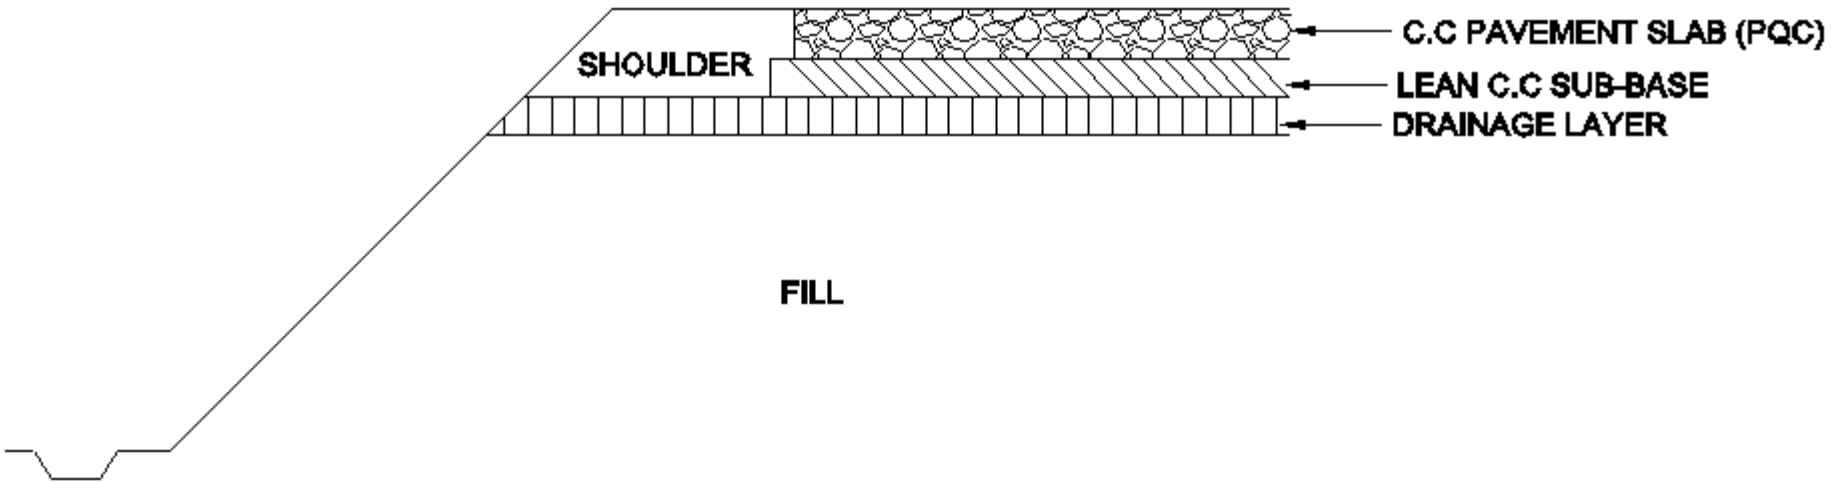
TYPICAL CROSSECTION OF CEMENT CONCRETE PAVEMENT
